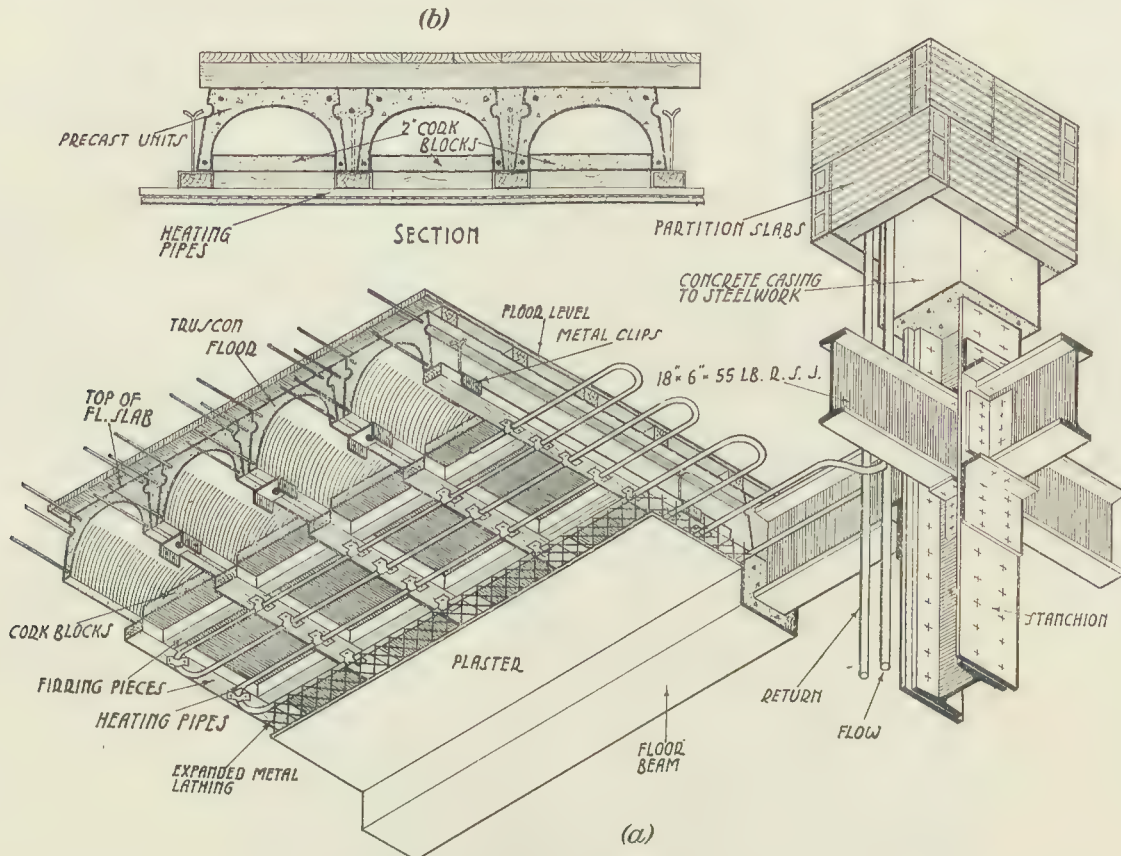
PANEL HEATING COIL ATTACHED TO UNDERSIDE OF PRECAST CONCRETE FLOOR UNITS
